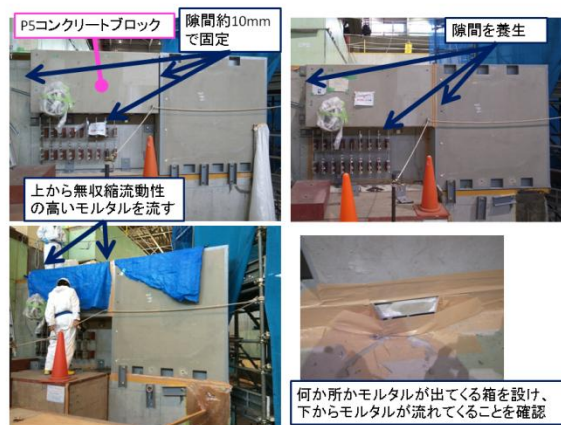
Pour mortar into the gaps between the P5 concrete block and the concrete walls surrounding the P5 block.
